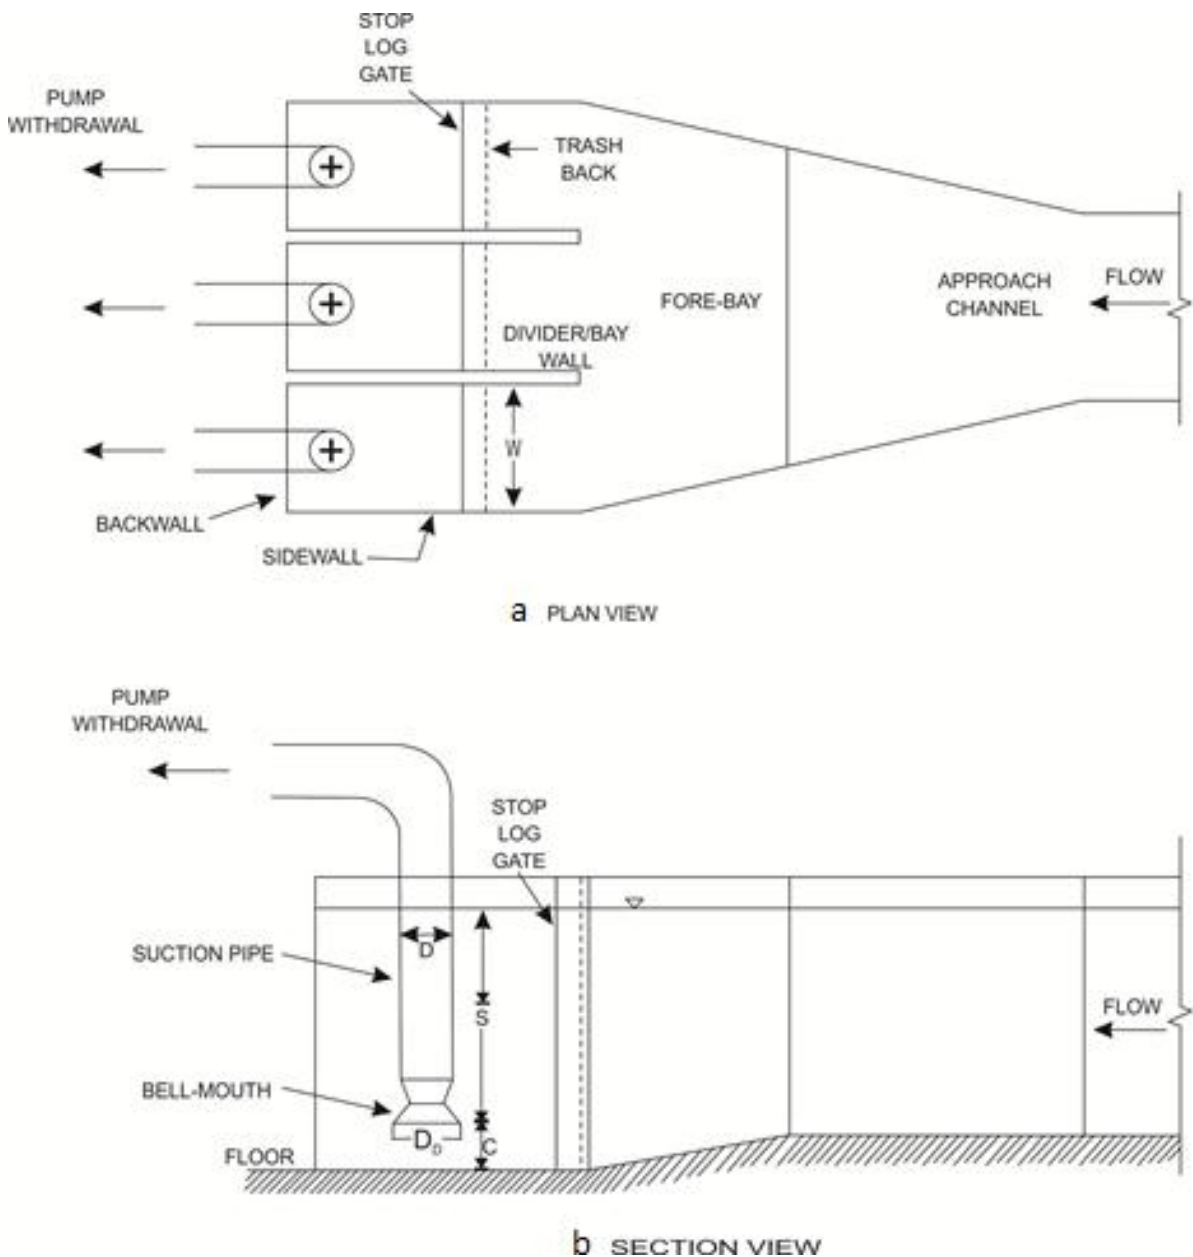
General features of a multiple pump sump intake (a) plan view and (b) sectional view
